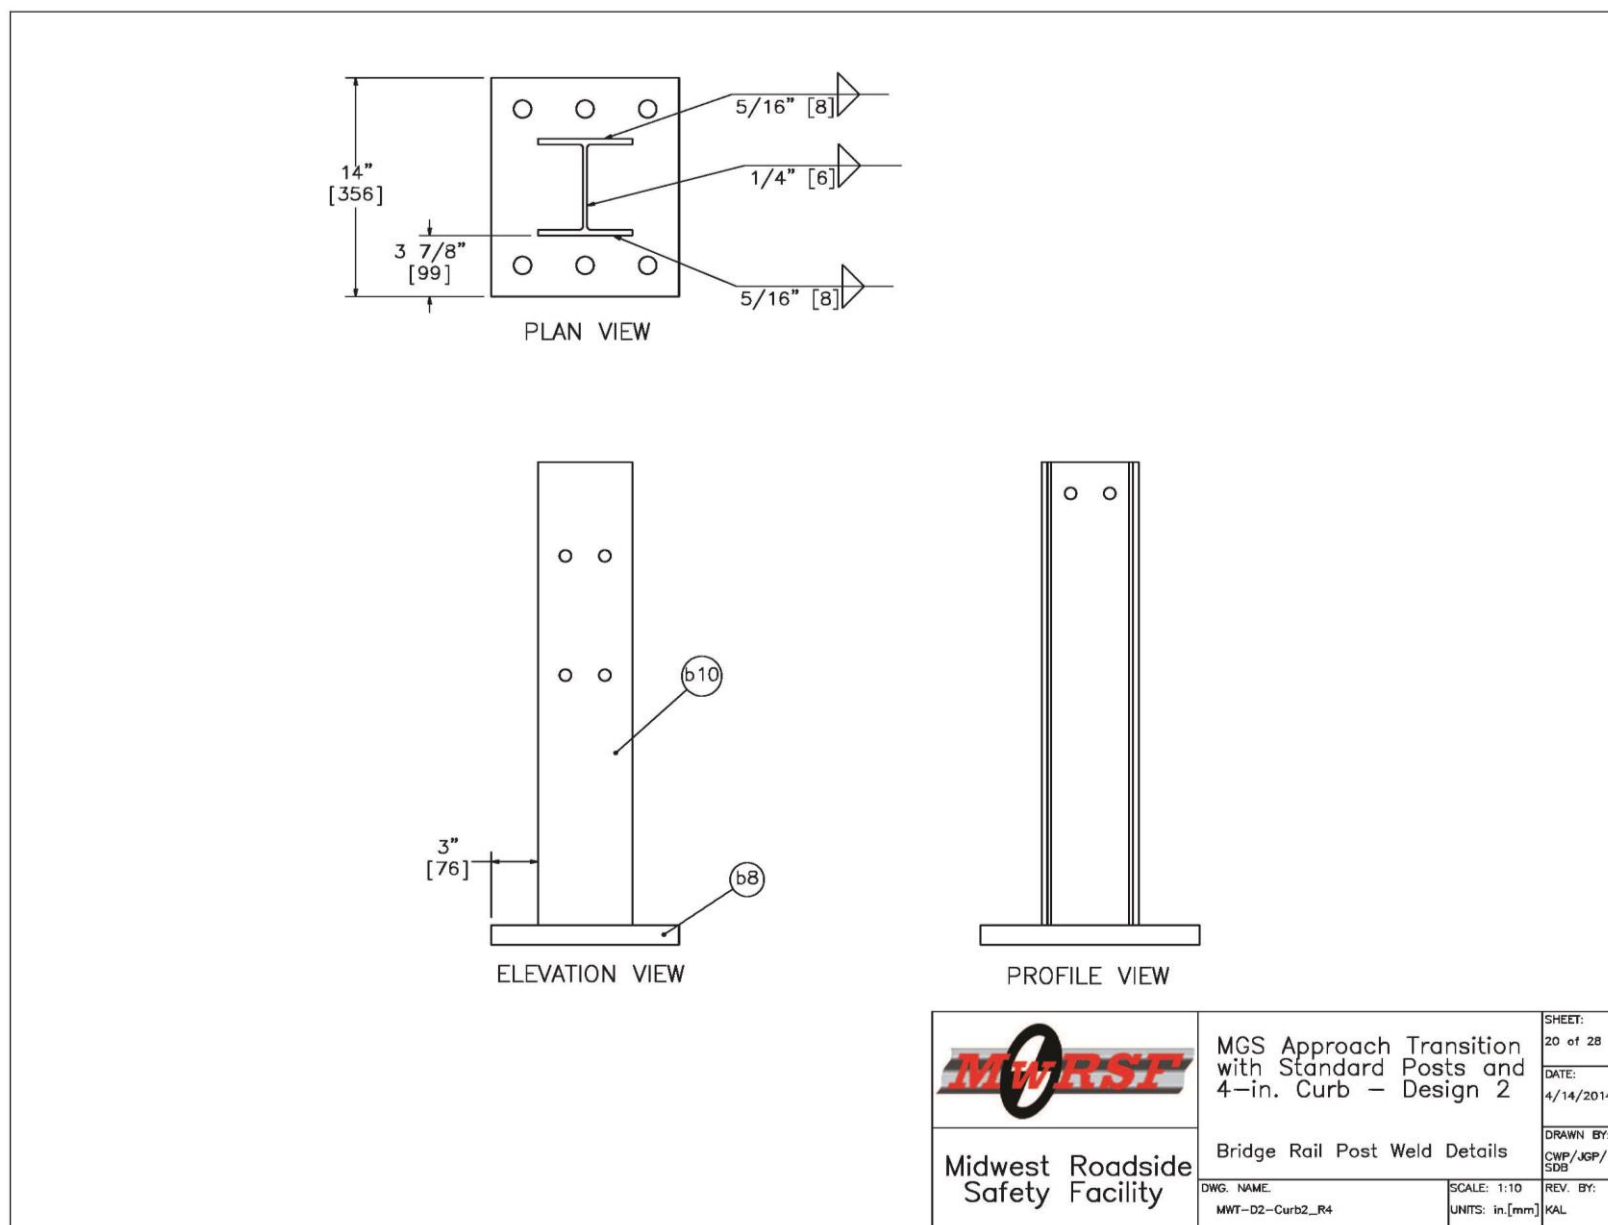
Bridge Rail Post Weld Details, Test Nos. MWTC-2 and MWTC-3
